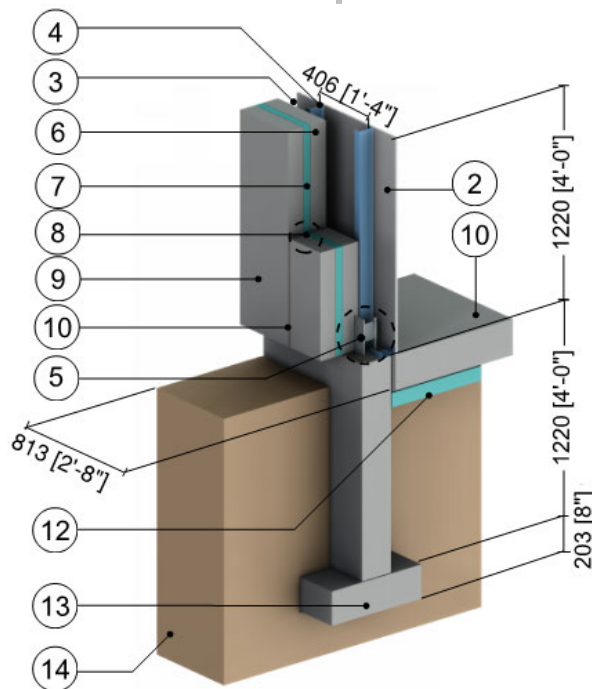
| Insulated Concrete Floor Slab – Concrete Column Intersection
